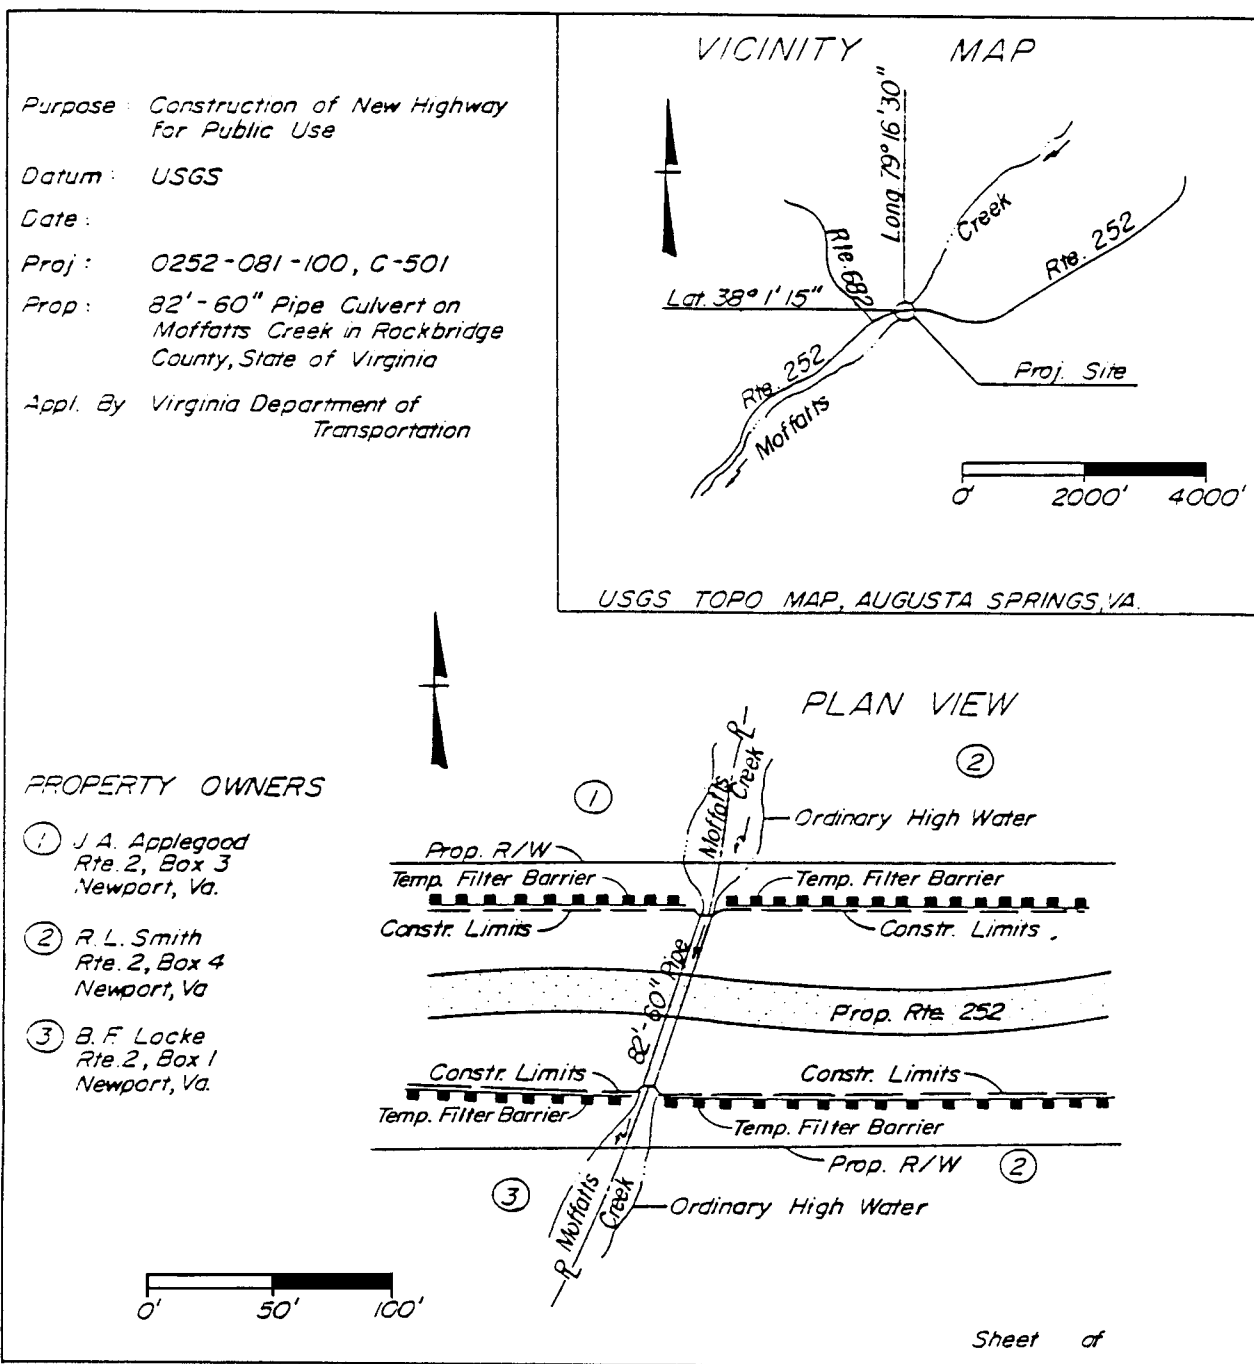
CULVERT (NON-TIDAL) PLAN VIEW
